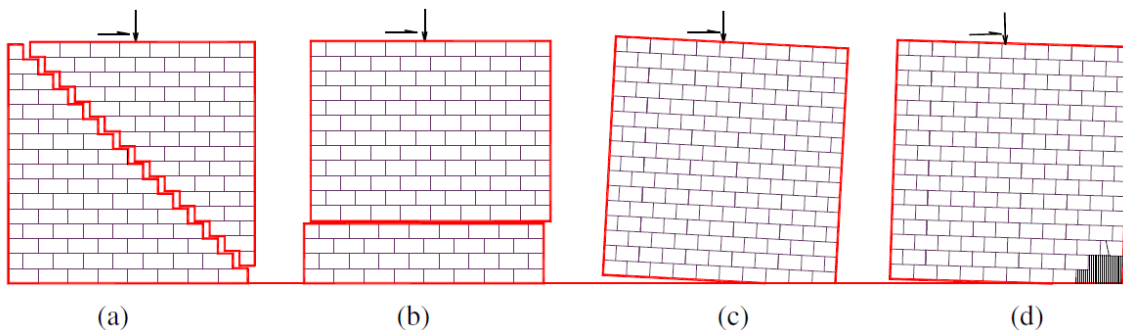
In-plane Failure modes. a) Shear failure. b) Sliding Failure. c) Rocking Failure. d) Toe crushing. (ElGawady, 2006)
